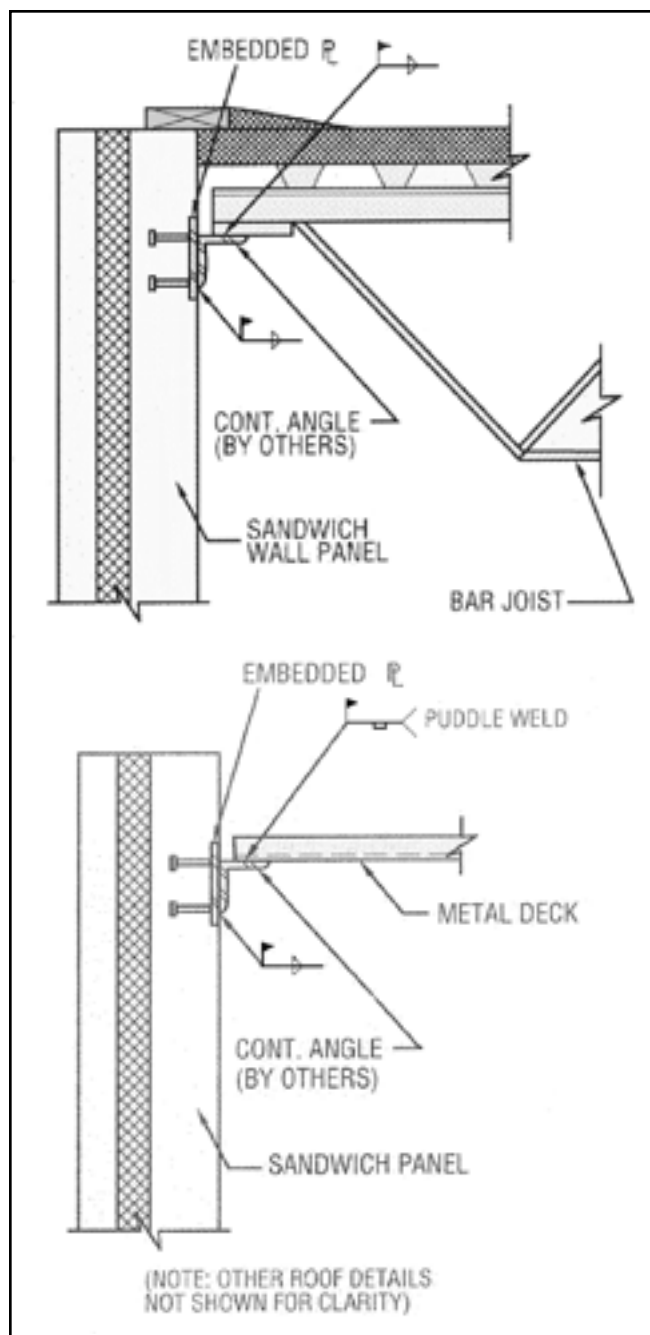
Typical connections in precast sandwich wall panels influenced by short stud use.²
